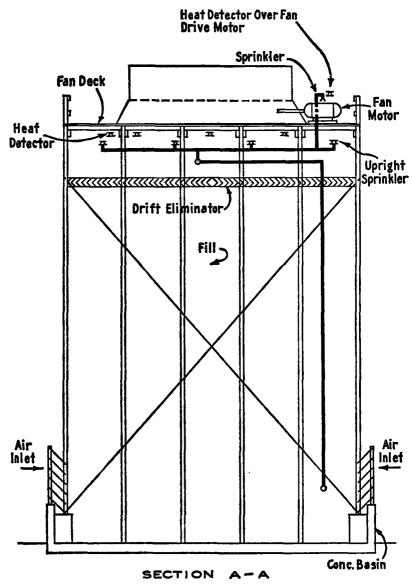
Typical deluge or dry pipe fire protection arrangement for counterflow towers.
